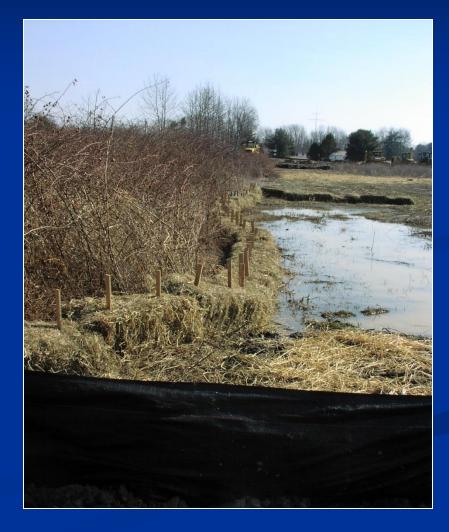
Placement and Anchoring Detail Bale Sediment Barriers
